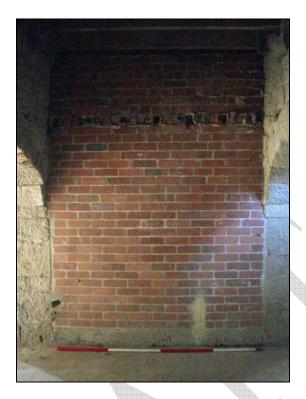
Photograph of the brick wall which blocks the original entrance to the mill (facing south-west) (scale = 2m).
